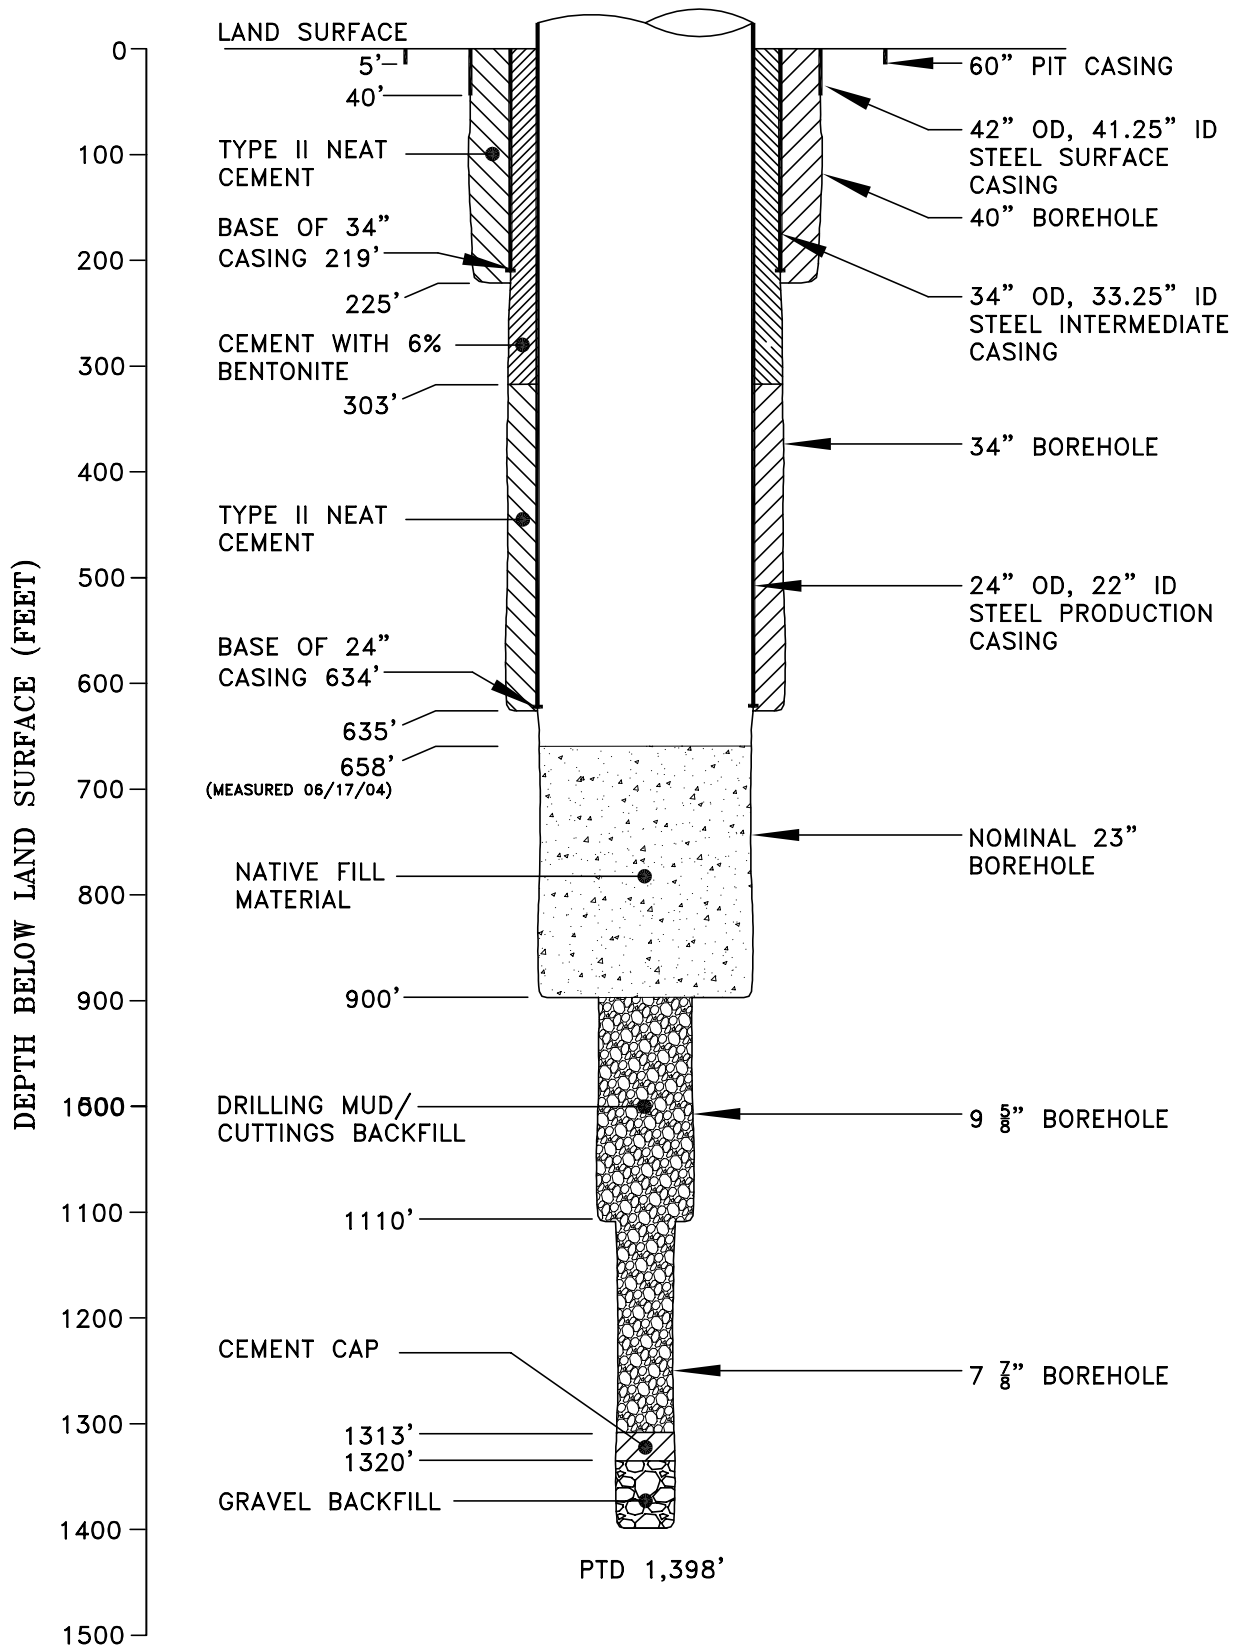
EXBRY-1 WELL CONSTRUCTION DETAILS.
